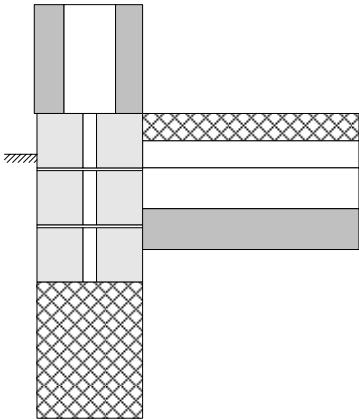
Section of a joint between the outer wall/foundation/slab-on-ground with three insulated light-weight concrete blocks in the foundation
